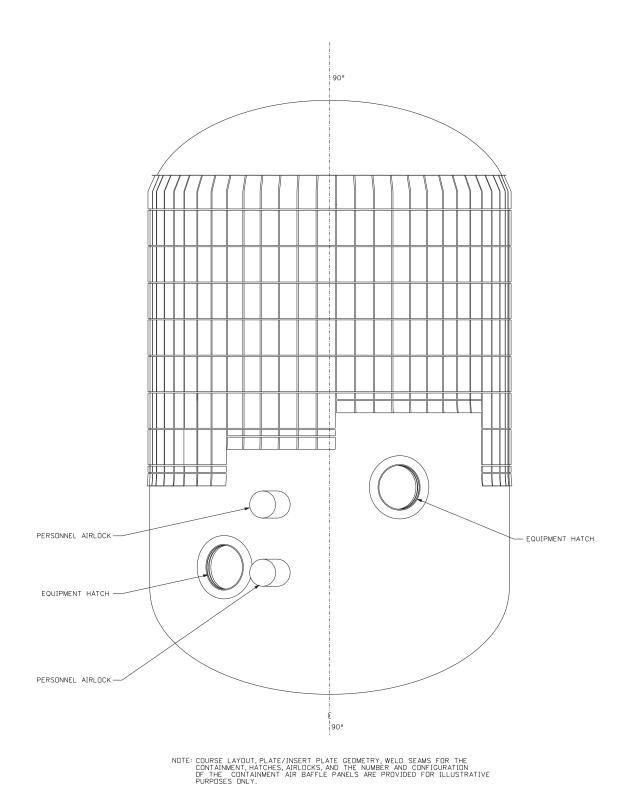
(Sheet 1 of 4) Containment Air Baffle General Arrangement
